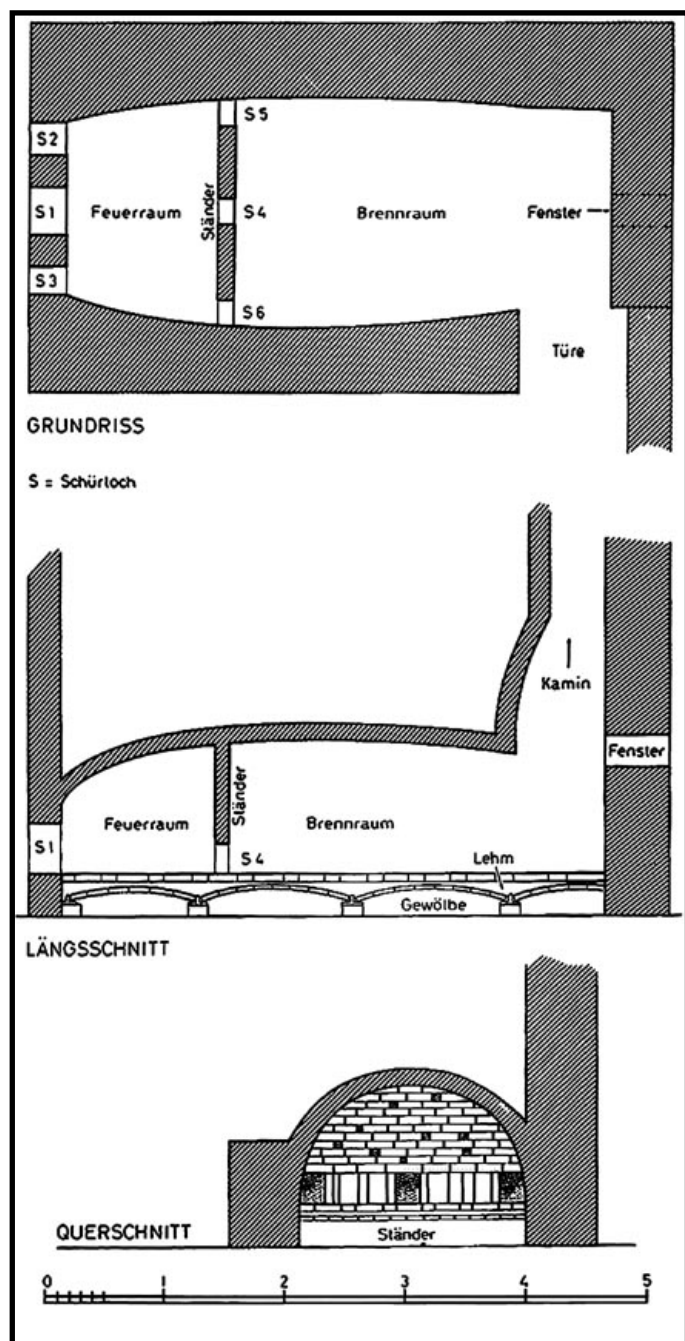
Cross-draught kilns with a vertical separation of fireplace and firing chamber, disposed one behind the other. Wildenhäusle, Baden-Württemberg D (Stachel 1983, Abb. 9).
